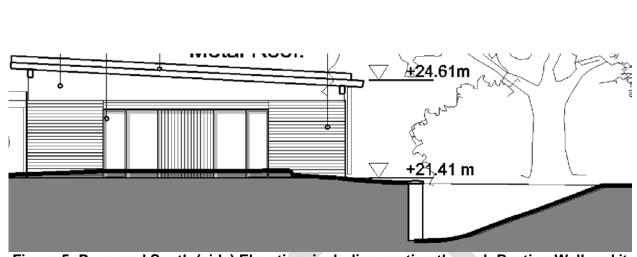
Proposed South (side) Elevation, including section through Bastion Wall and its ditch.
